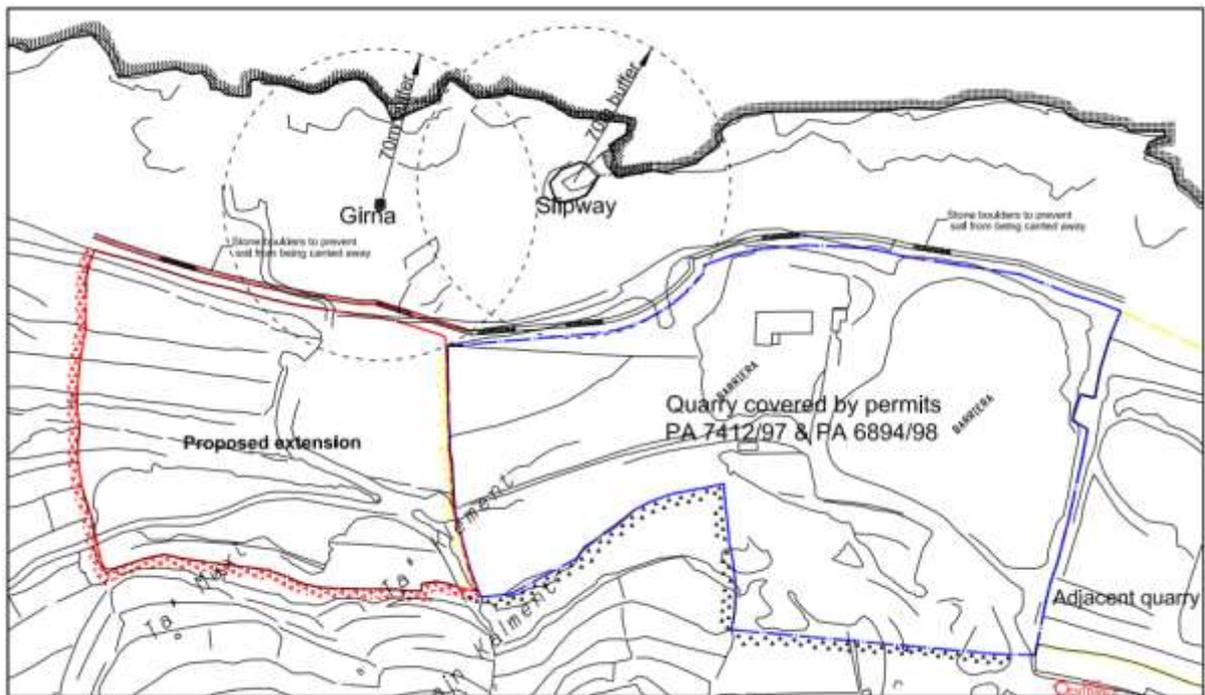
Block Plan (Source: PA/05665/18/Doc.1d)
